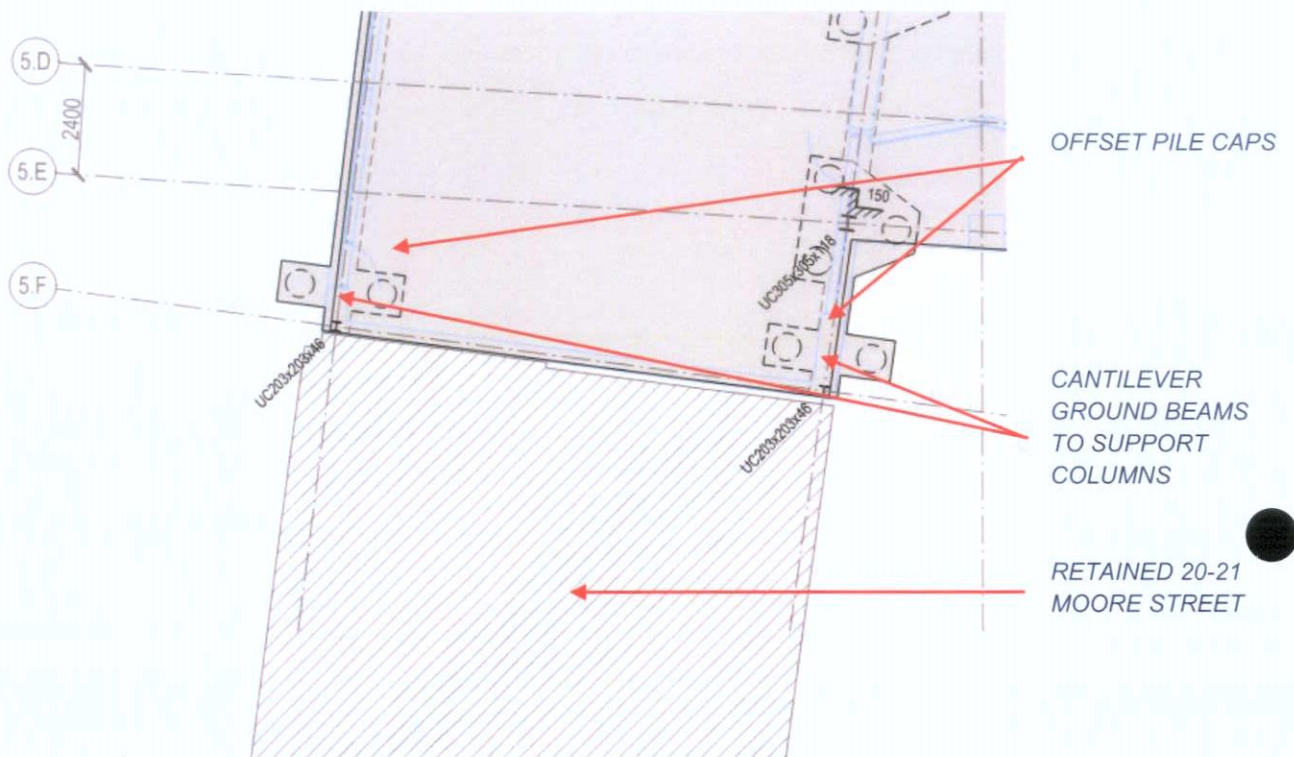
Proposed Foundation Arrangement Adjacent to Existing Building
